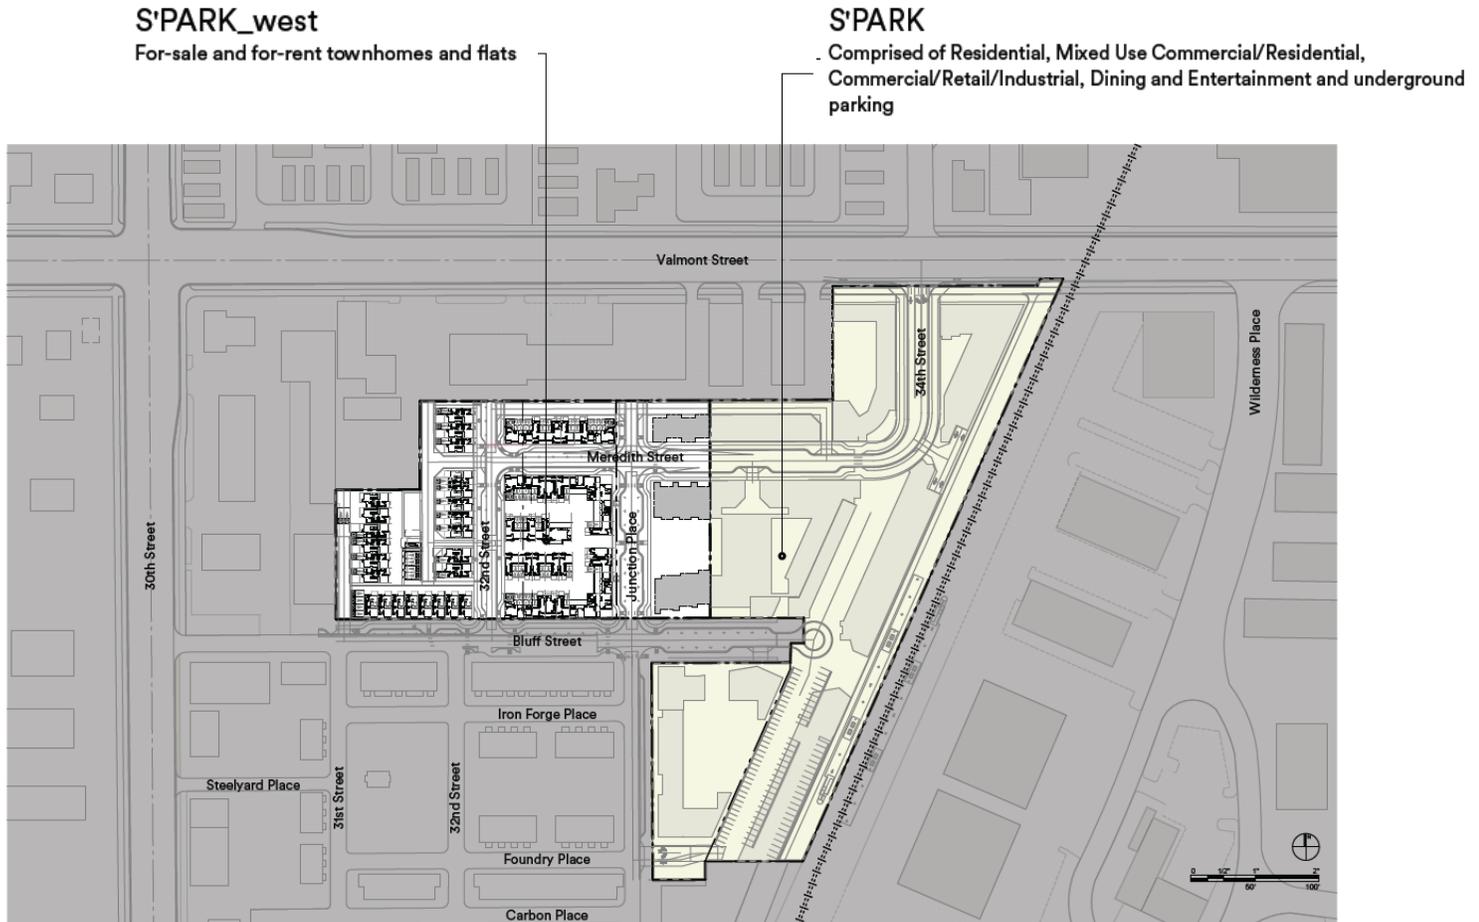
Proposed Concept Plan (currently under consideration) with relationship to S'PARK Concept Plan
